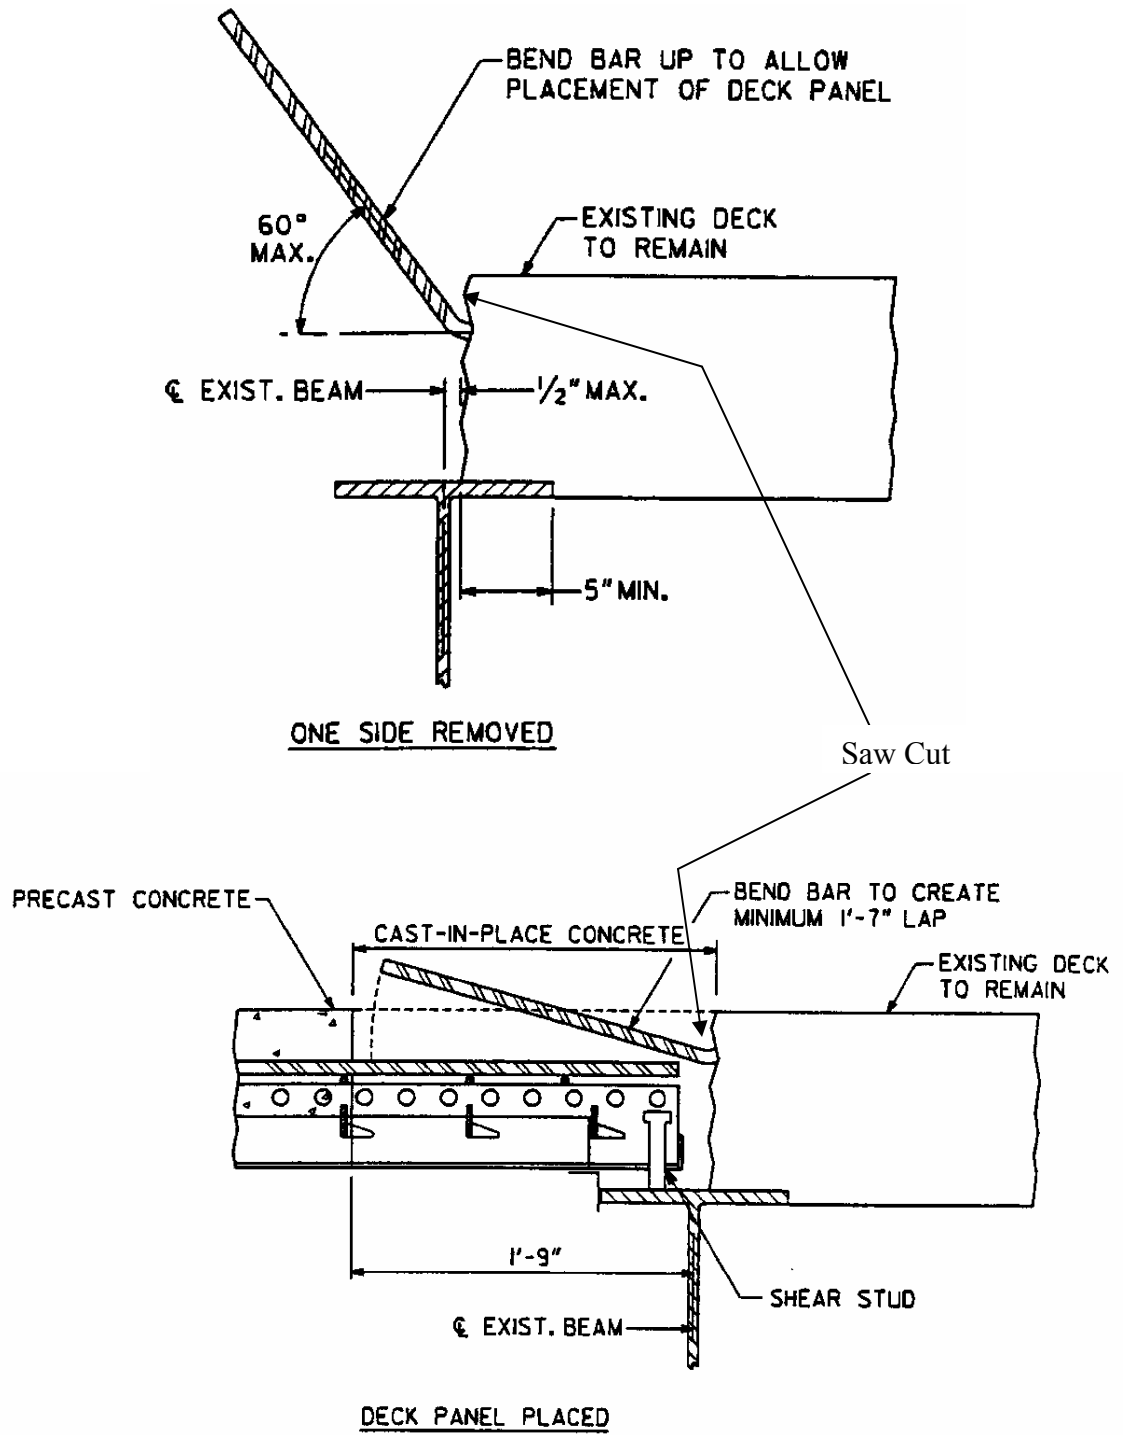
Longitudinal Connection/Joint between Panel and Existing Deck (2)
